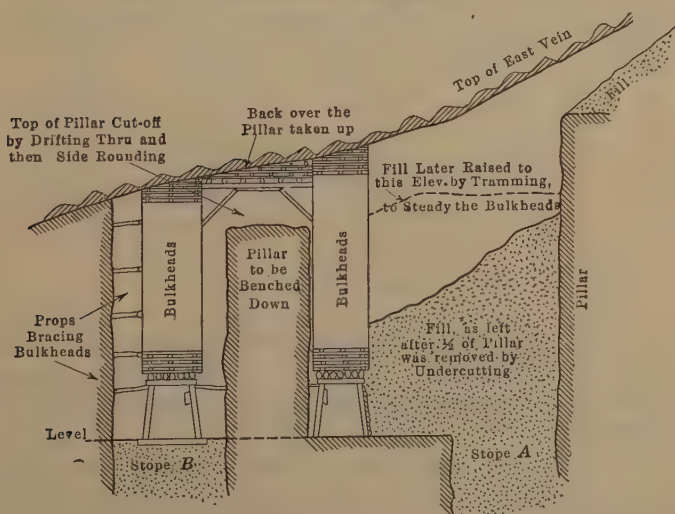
METHOD OF BENCHING PILLAR UNDER SUPPORTED ROOF.
